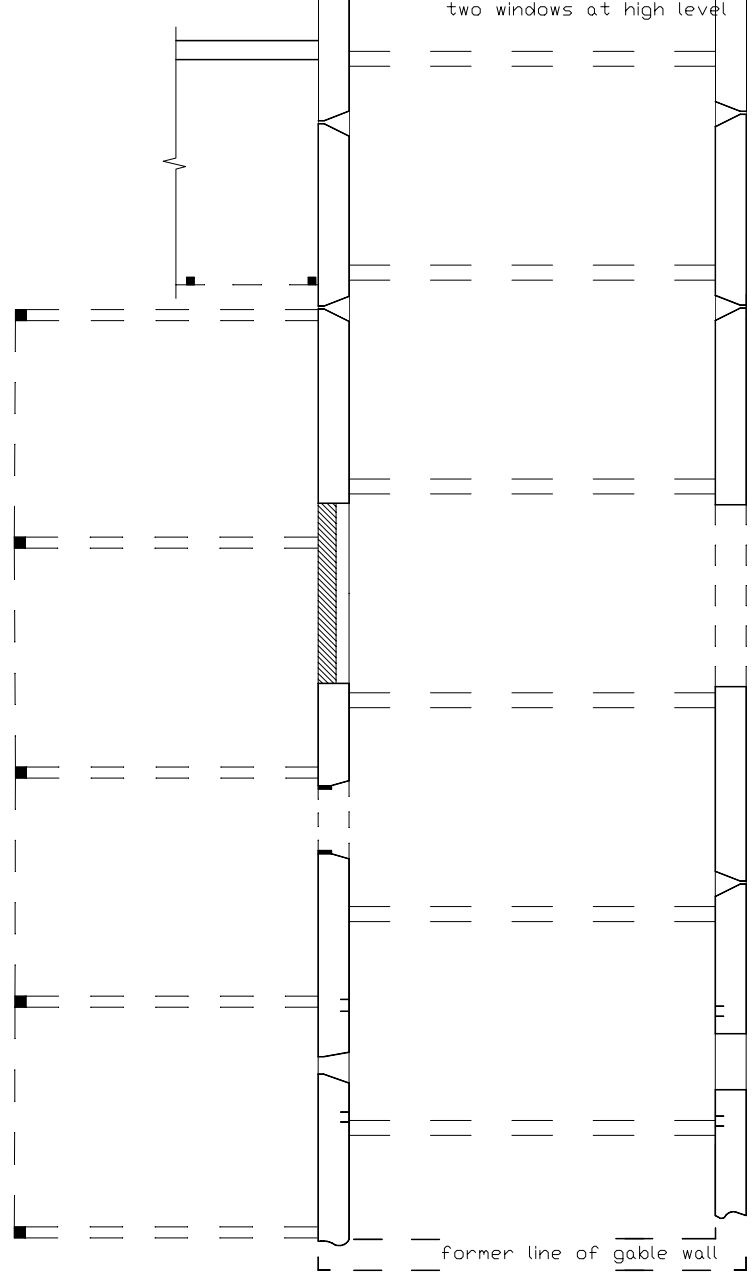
Plan of main Stable Block (Building G). Scale 1:200
